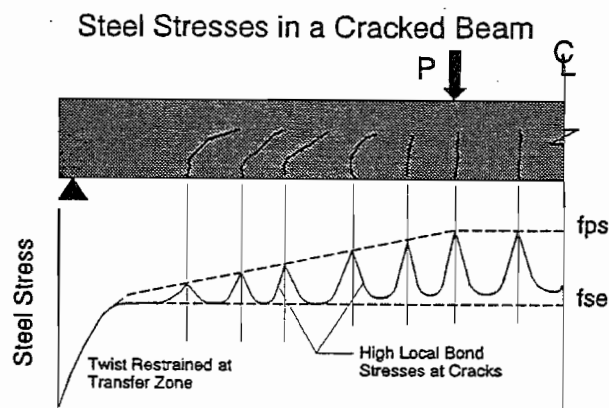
Pretensioned Steel Stresses in a Cracked Beam
